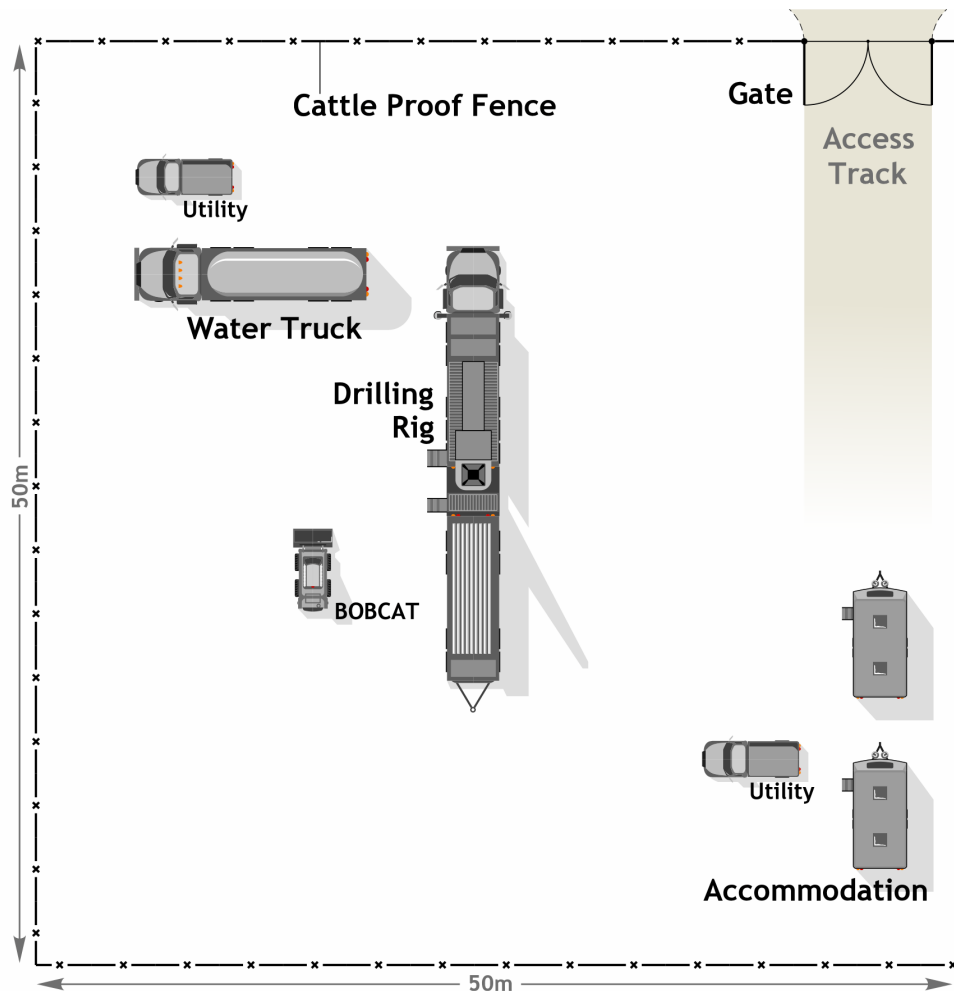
Proposed Water Bore Lease Area Layout (figures not to scale)
